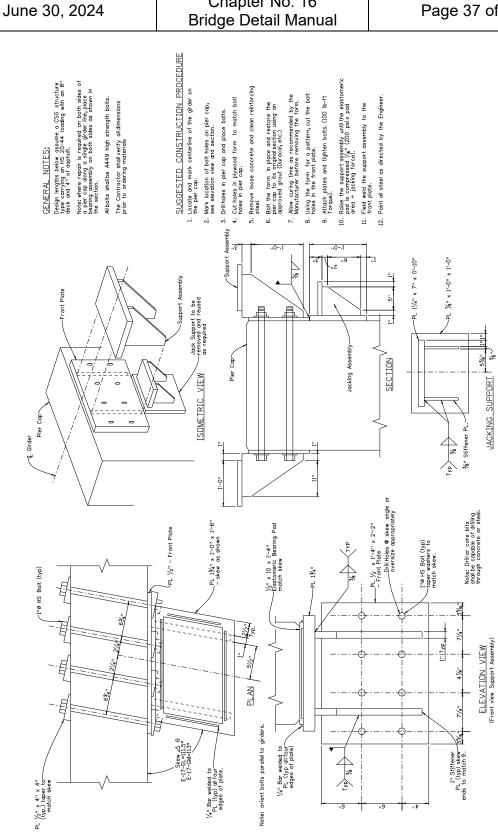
(F)-3 Sample Worksheet for Corbel Placement Details
